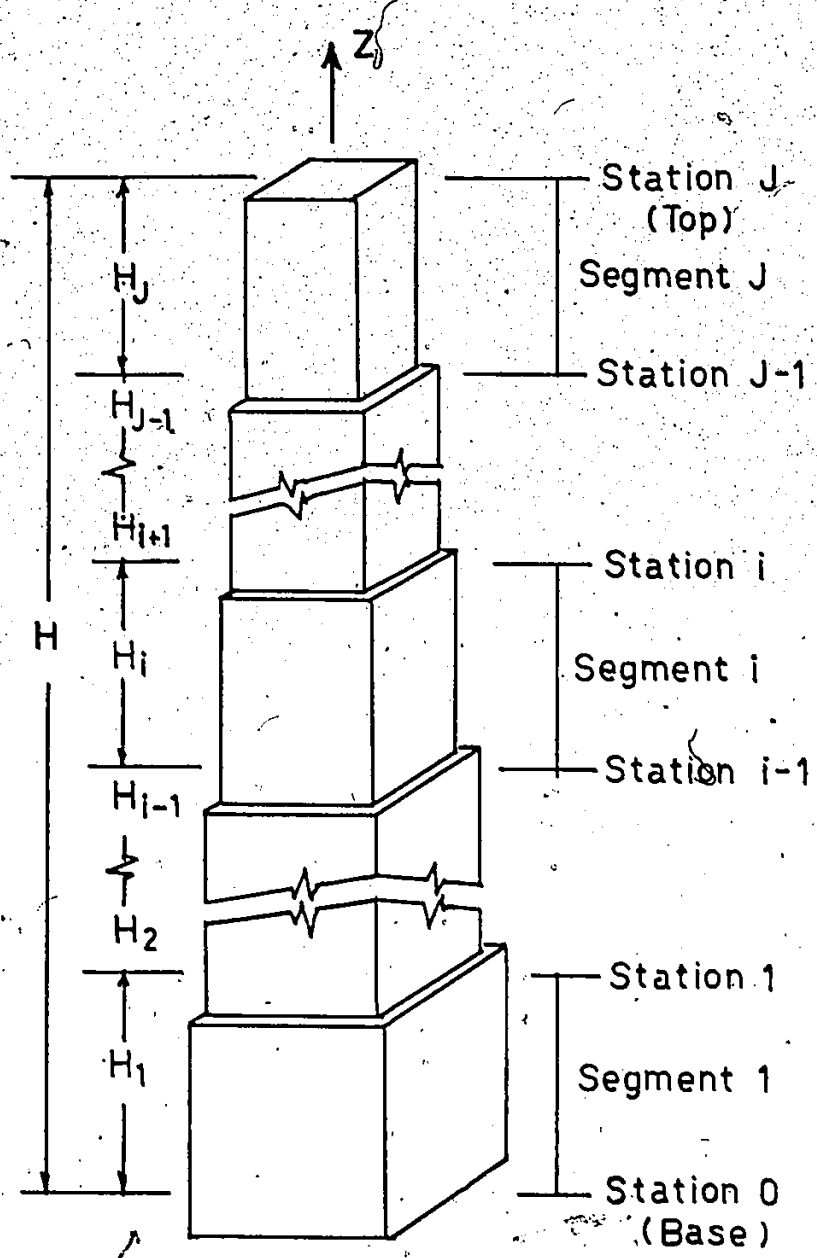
GEOMETRY OF NON UNIFORM SHEAR WALL STRUCTURES
